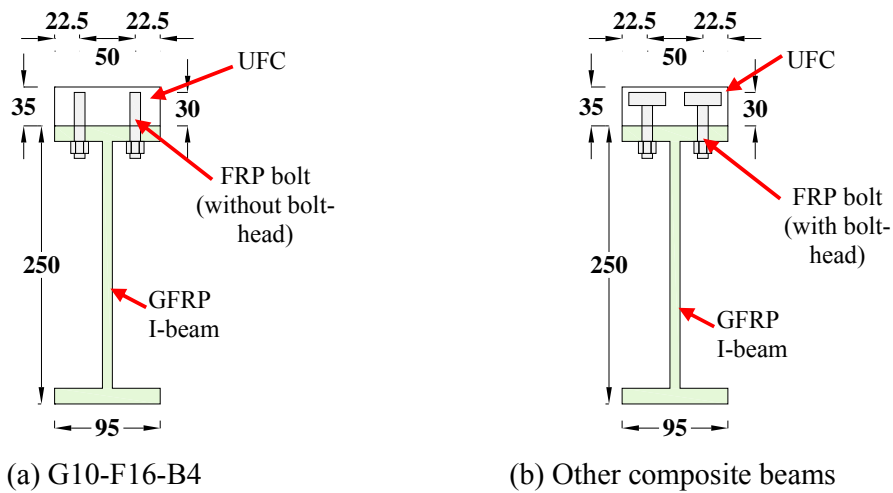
Cross-sectional details of GFRP and UFC composite beams (Units: mm)
